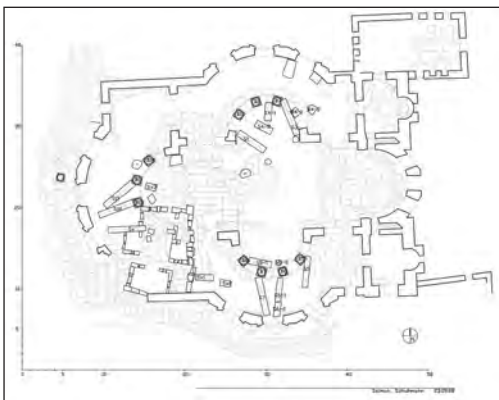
Resafa, Tetraconch Church, ground plan by Wolf Wirth. Supplemented with the so-called Iwan-House, parts of later buildings and pillars in danger of collapsing, Ibrahim Salman/Axel Schuhmann 2008.
